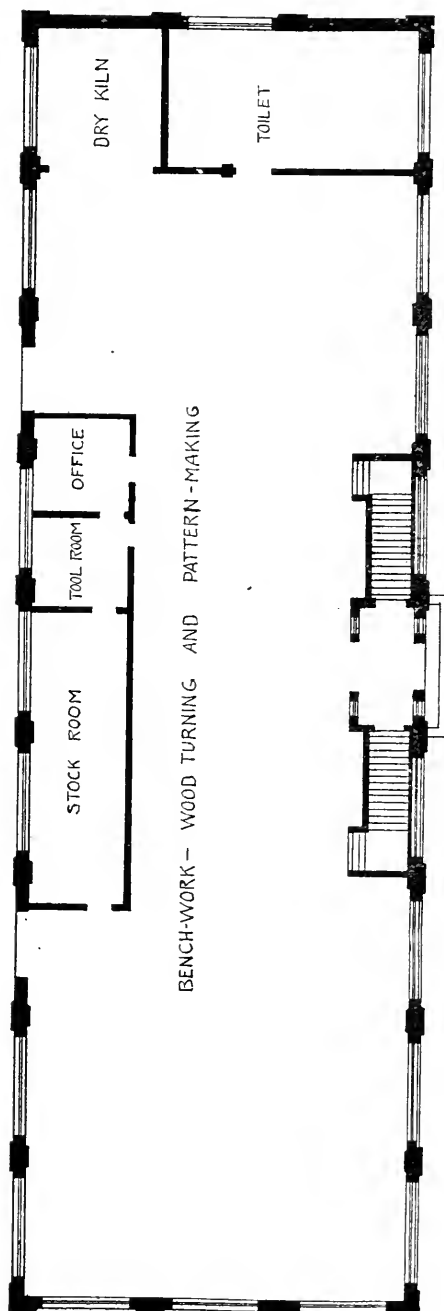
FIRST FLOOR PLAN OF SHOP NUMBER ONE.
